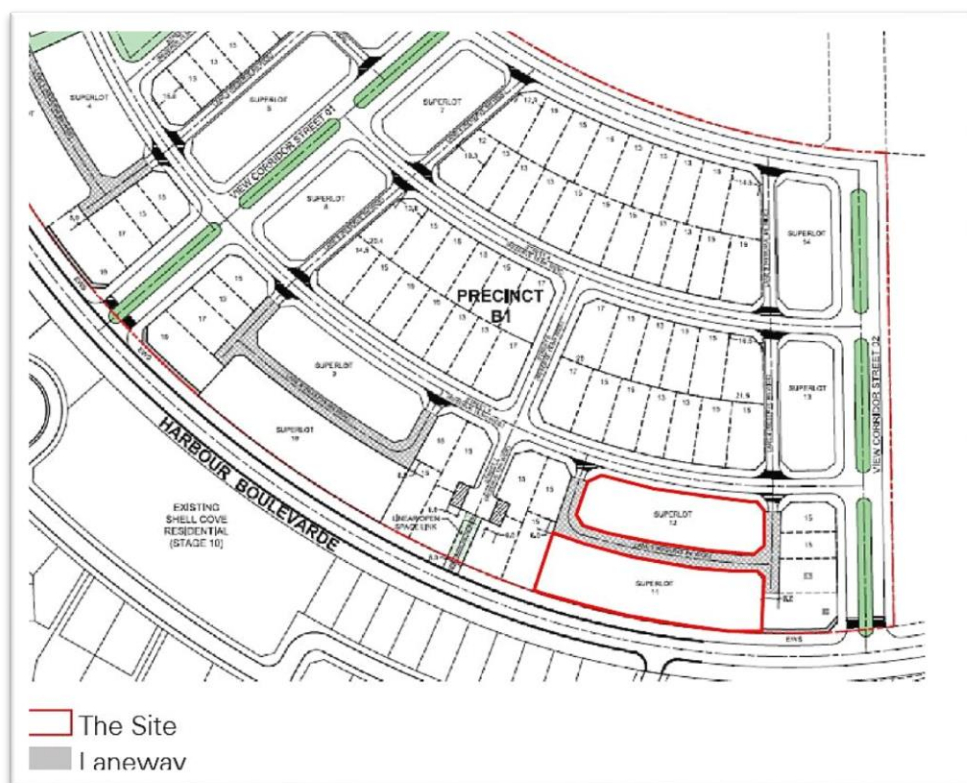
Unregistered Subdivision Layout (approved by DA411/2013)
